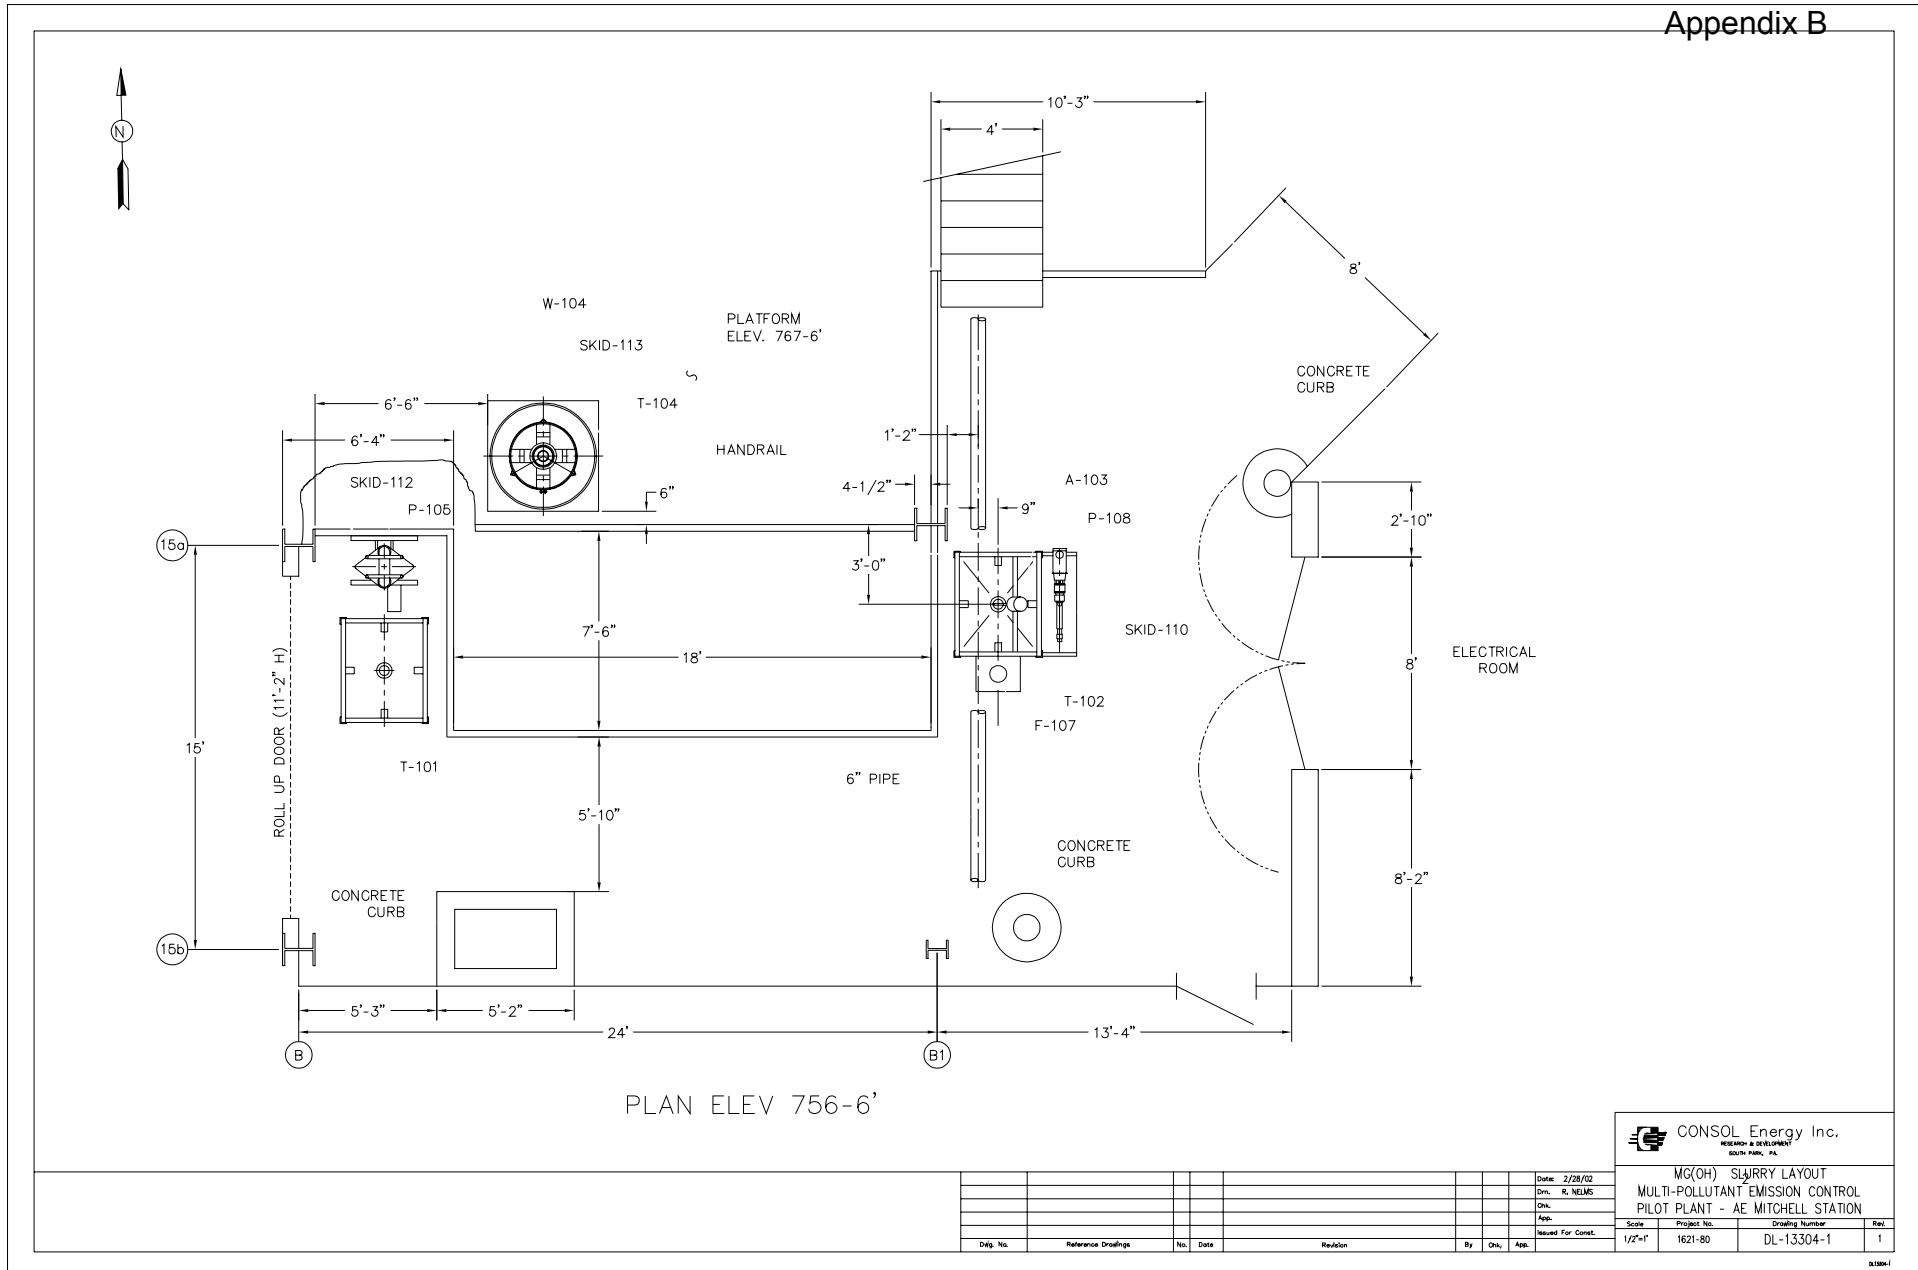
General Arrangement & Piping, Enlarged Plan & Section Views
